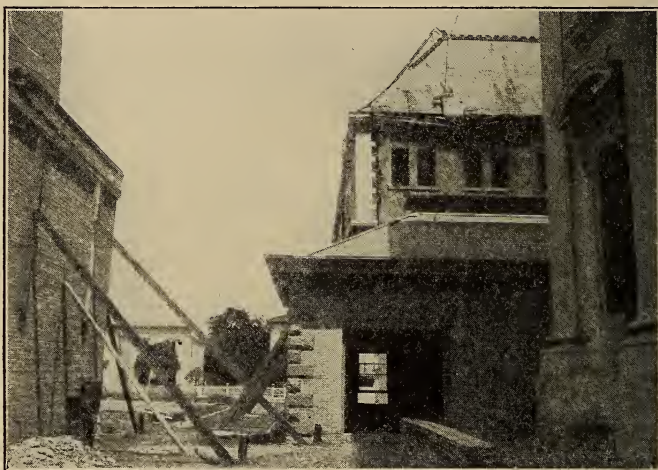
Rear View, Hall of Records, San José, Showing How the Heavy Stone Outer Walls Cracked Away from the Interior Framing Due to Improper Anchoring of Walls to Floors and Roof.
